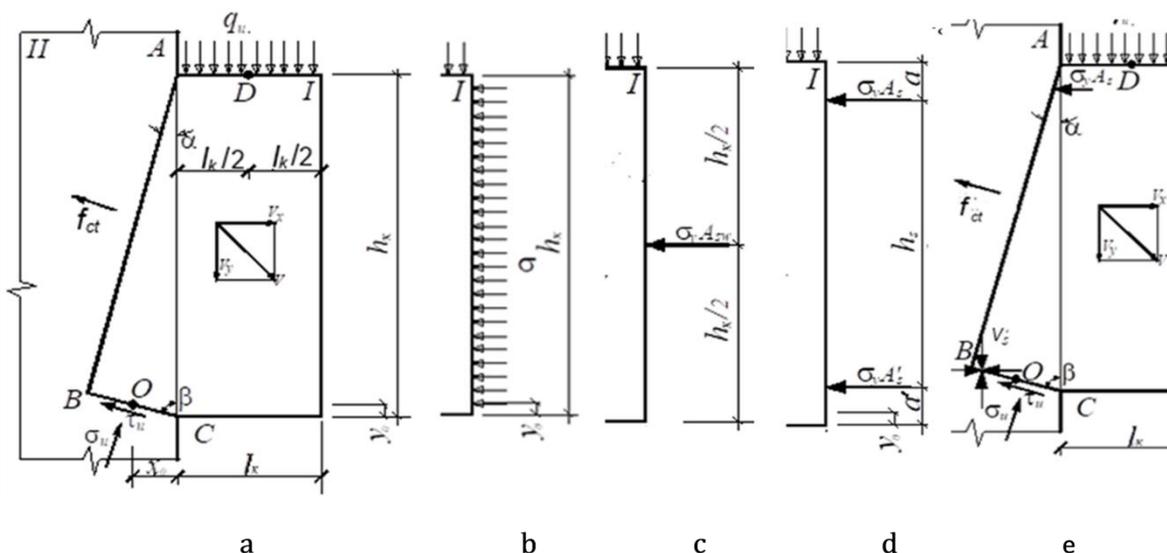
Kinematic failure mechanism of the rectangular key: a – is made of concrete; b – compressed; c – reinforced with rebar in one level; d – reinforced with rebar in two levels; e – reinforced with rebar in two levels when taking into account the dowel effect in the compressed reinforcement.
